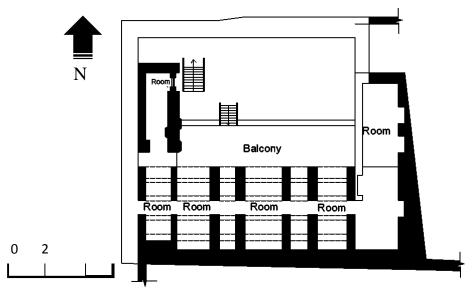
First-floor plan of a traditional building in Dezful (Ghobadian, 2009)
